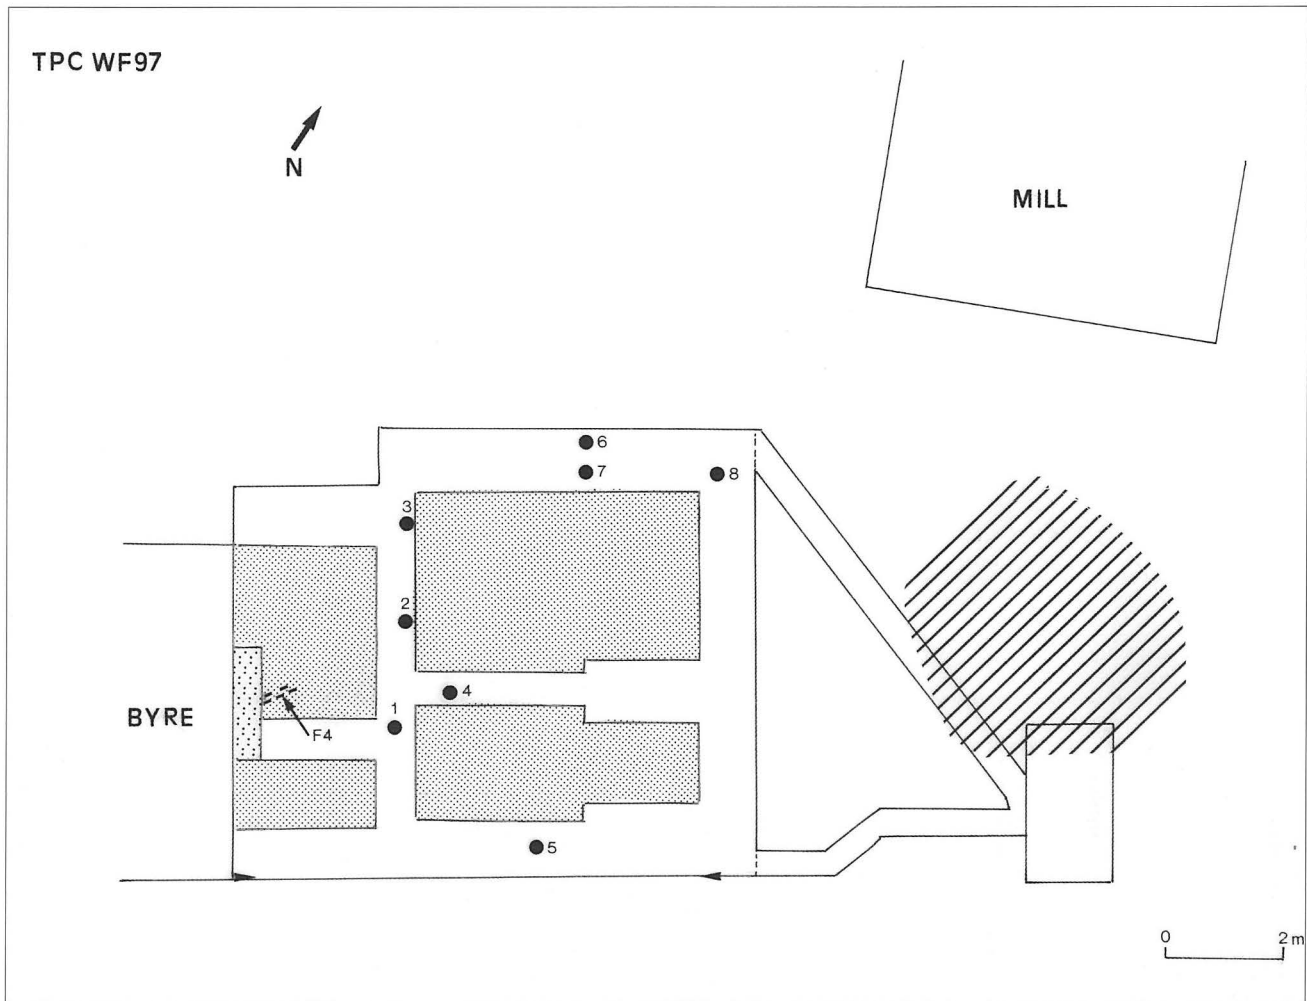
Woolcombe farmhouse (1997) plan of new foundations on bottling plant site. Numbered dots 1 to 8 are the locations of the remains of hardwood posts within the new foundation trenches. F4 is a Type 3 field drain. The shaded zone to the right is the site of a former cess pit (Hewitt 1997b, 20)
